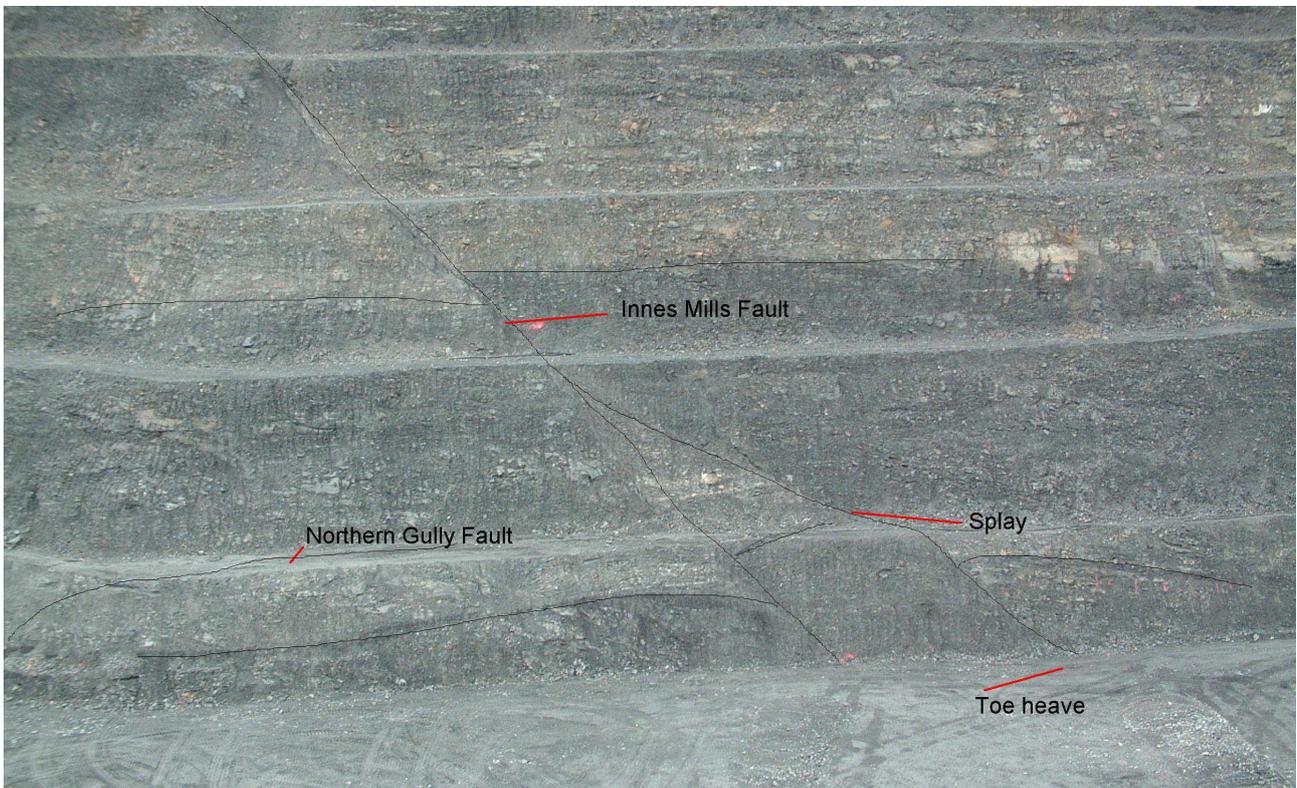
Innes Mills Stage 4 east wall – large scale structures outcropping in the wall, 2002. These same structures are expected to intersect Innes Mills Stage 9 east wall.
